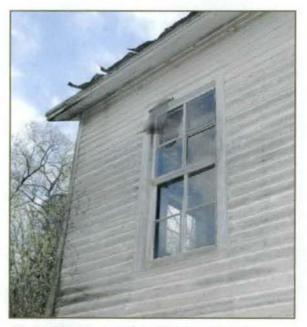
House, View #18, East Façade, Detail of Window at Addition, Camera Facing West
